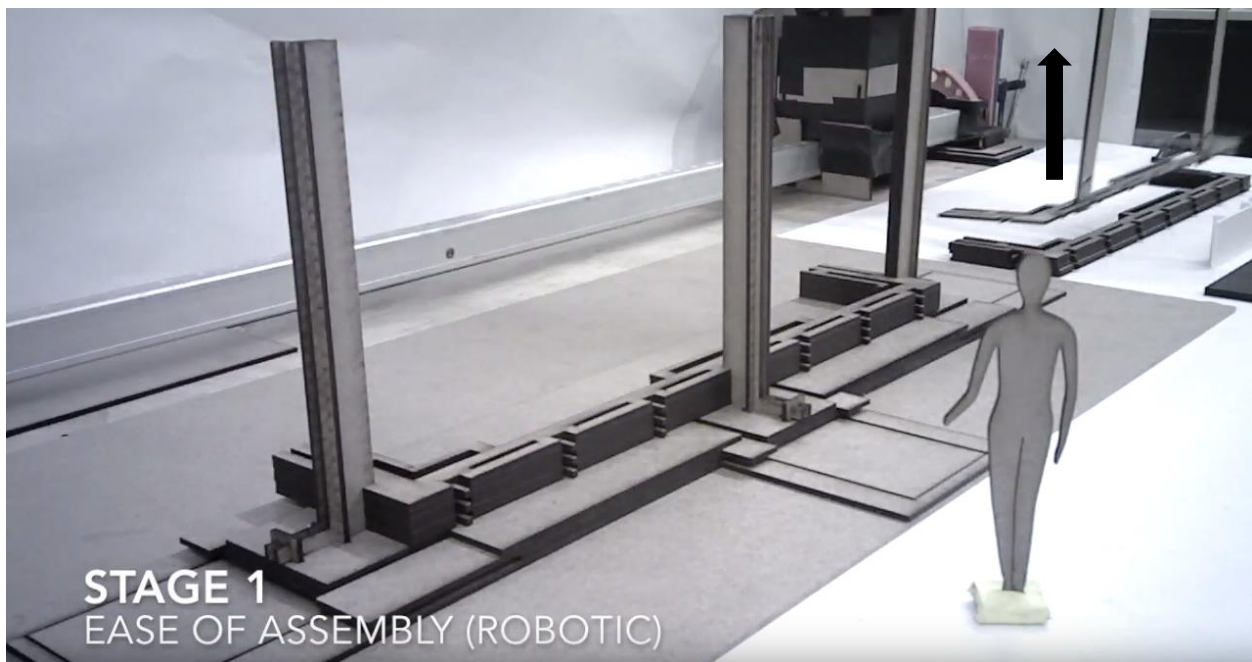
(a). Stage 1: Ease of Assembly - Automated (Source: Demonstration photo). The photo shows automated retrieval of cut parts on-site.
